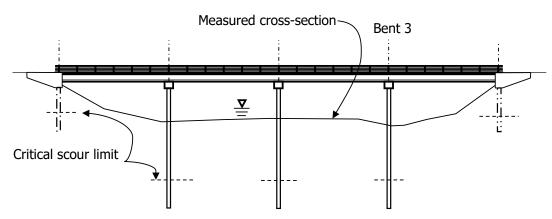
Elevation view showing scour elevations and stream cross-section for a bridge.
